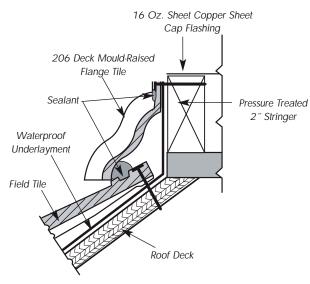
Deck Section Showing 206 Deck Mould-Raised Flange Tile
